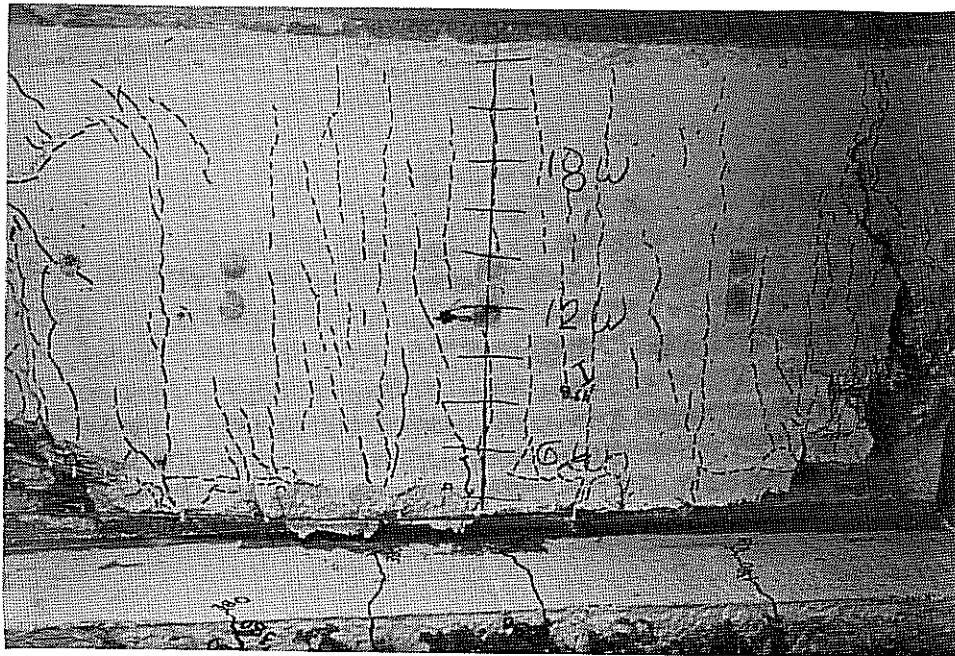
Specimen 12S29 Compression Flange Close-Up
